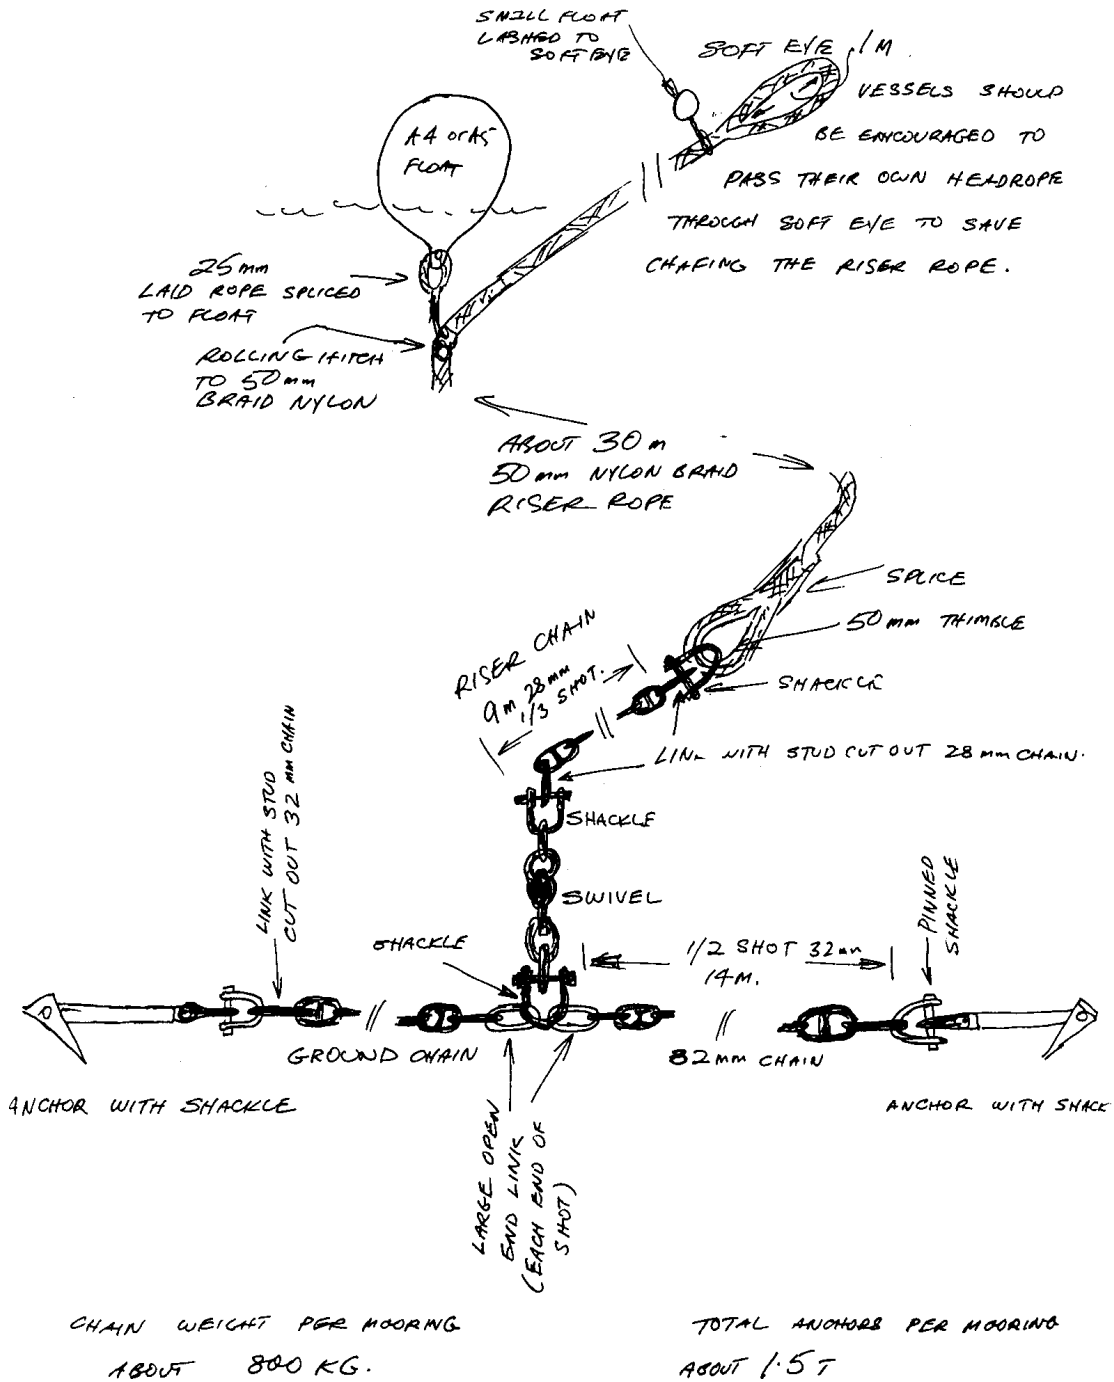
Drawing of 'Big Boat' moorings (courtesy David Barnett, Offshore Moorings).
